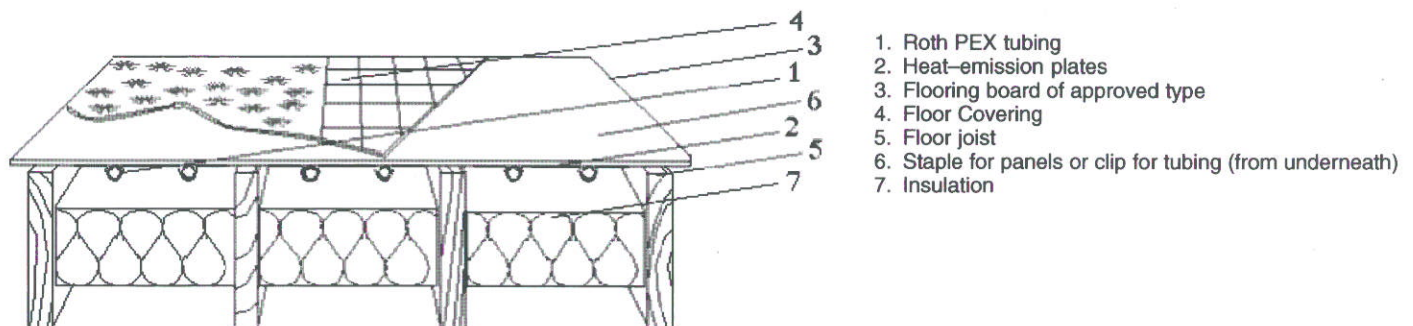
SUSPENDED FLOOR, INSTALLATION FROM UNDERNEATH
